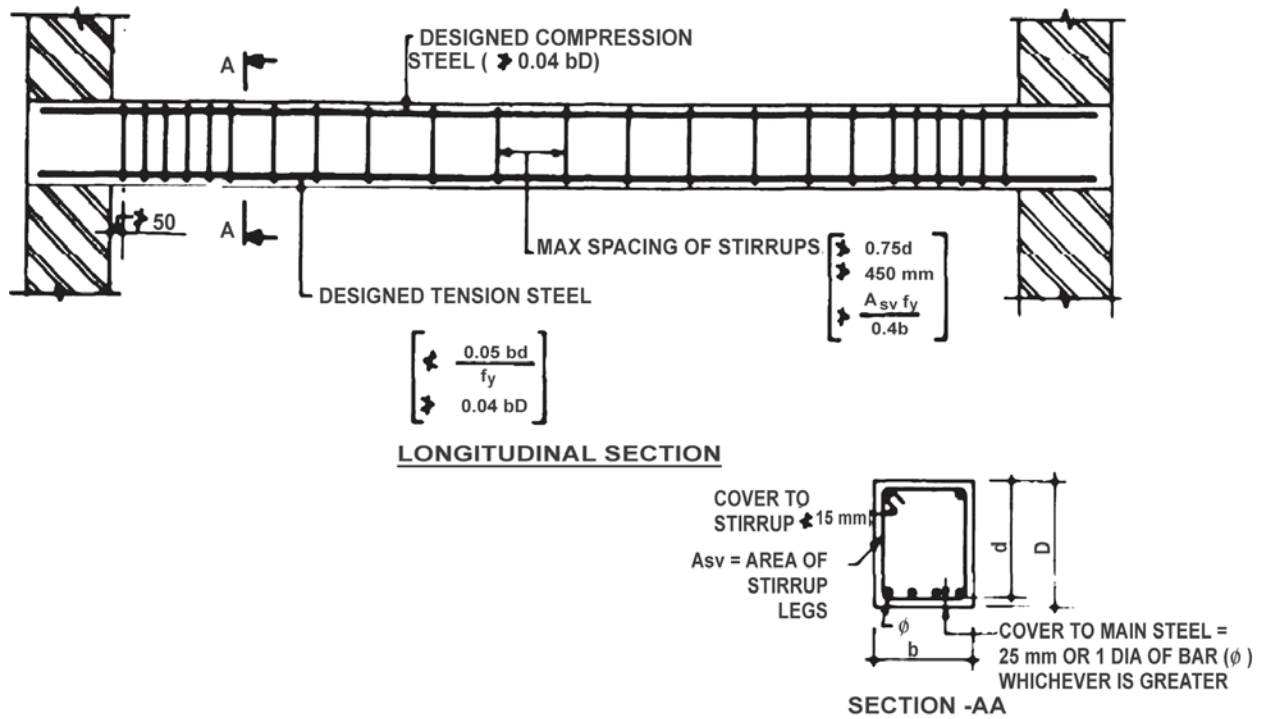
REINFORCEMENT REQUIREMENTS FOR BEAMS
